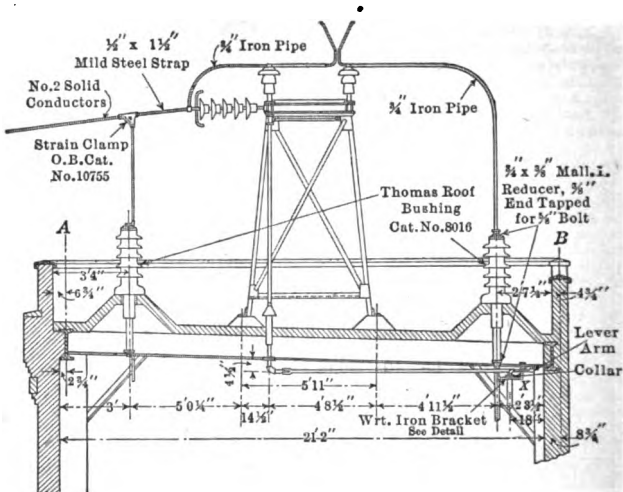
Typical roof construction showing horn gaps and roof insulators.
